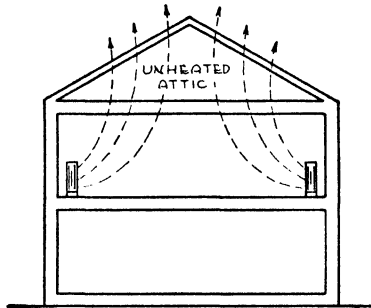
Section through Building Showing Unheated Attic: Heat Flow through Top Floor Ceiling as Well as through Roof Structure
